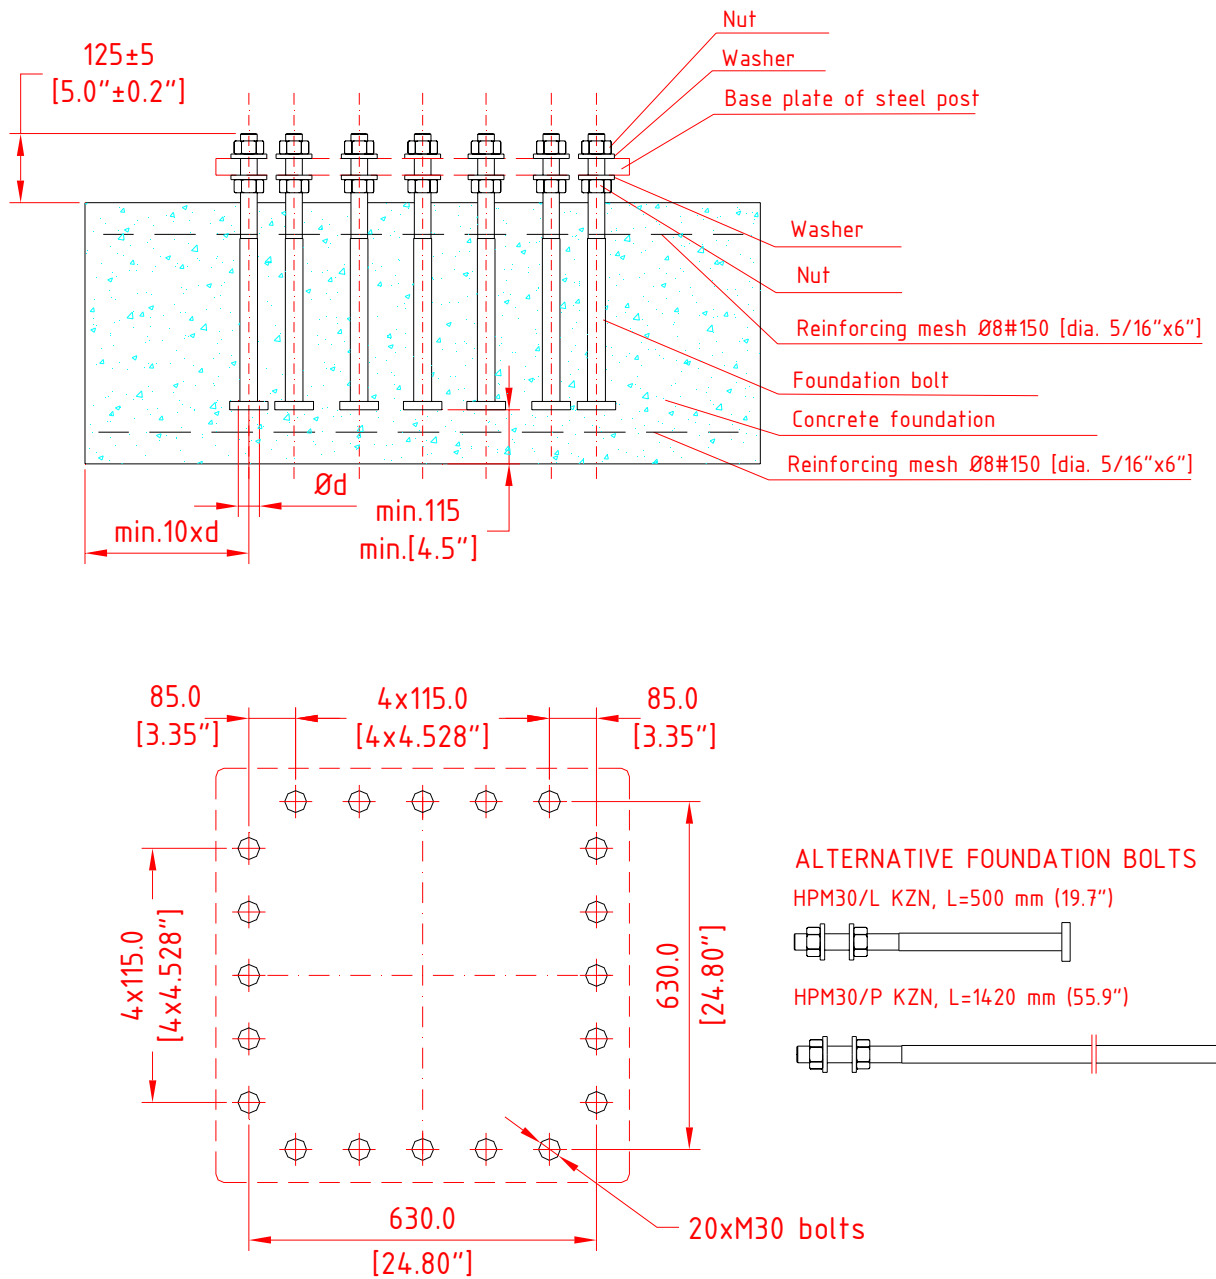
Principal draft of foundation, casting jig for 20 bolts and foundation bolts of the mast.
